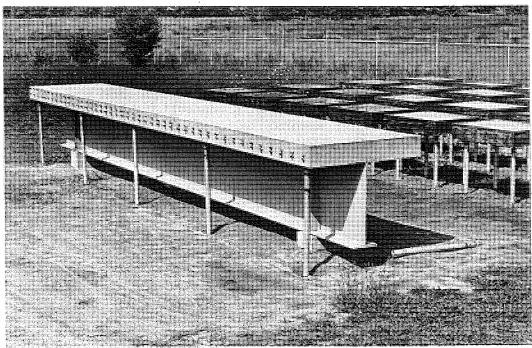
Field installation of laboratory cast deck specimens and simulated deck section (Galvanized--68 F-103). Water retaining dikes were added to the larger section at a later date.
